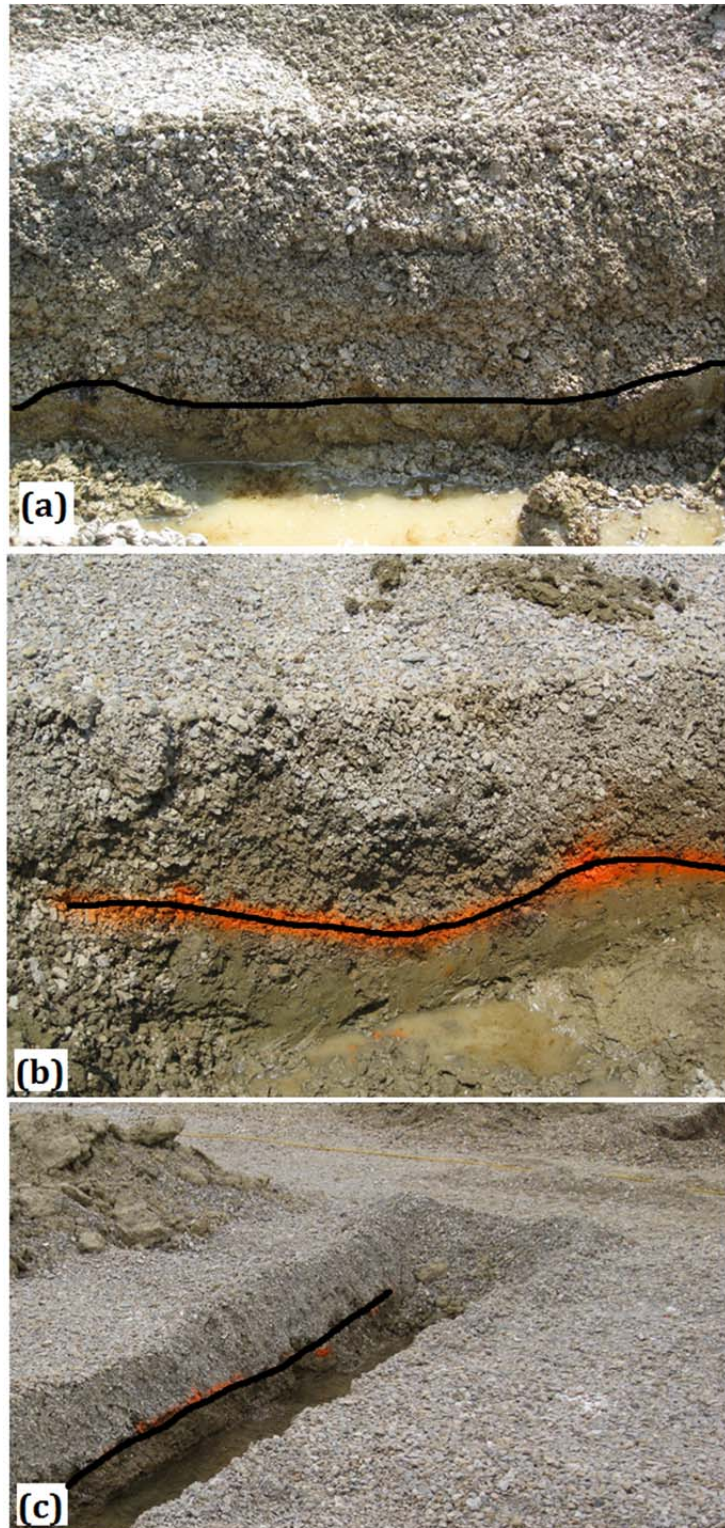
Excavated trench photos showing surface and base-subgrade interface deformations in test sections (a) 1, (b) 2, and (c) 3 for Cell 2 due to loading under flooded conditions
